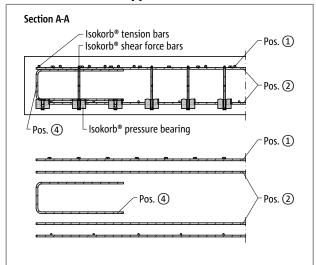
Schöck Isokorb® T type K: On-site reinforcement on the balcony side in the Section A-A; Pos.4 = side reinforcement on the free edge perpendicular to the Schöck Isokorb®
